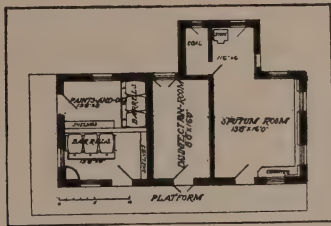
GERMICIDE HOUSE, FIREPROOF, OTISVILLE.
